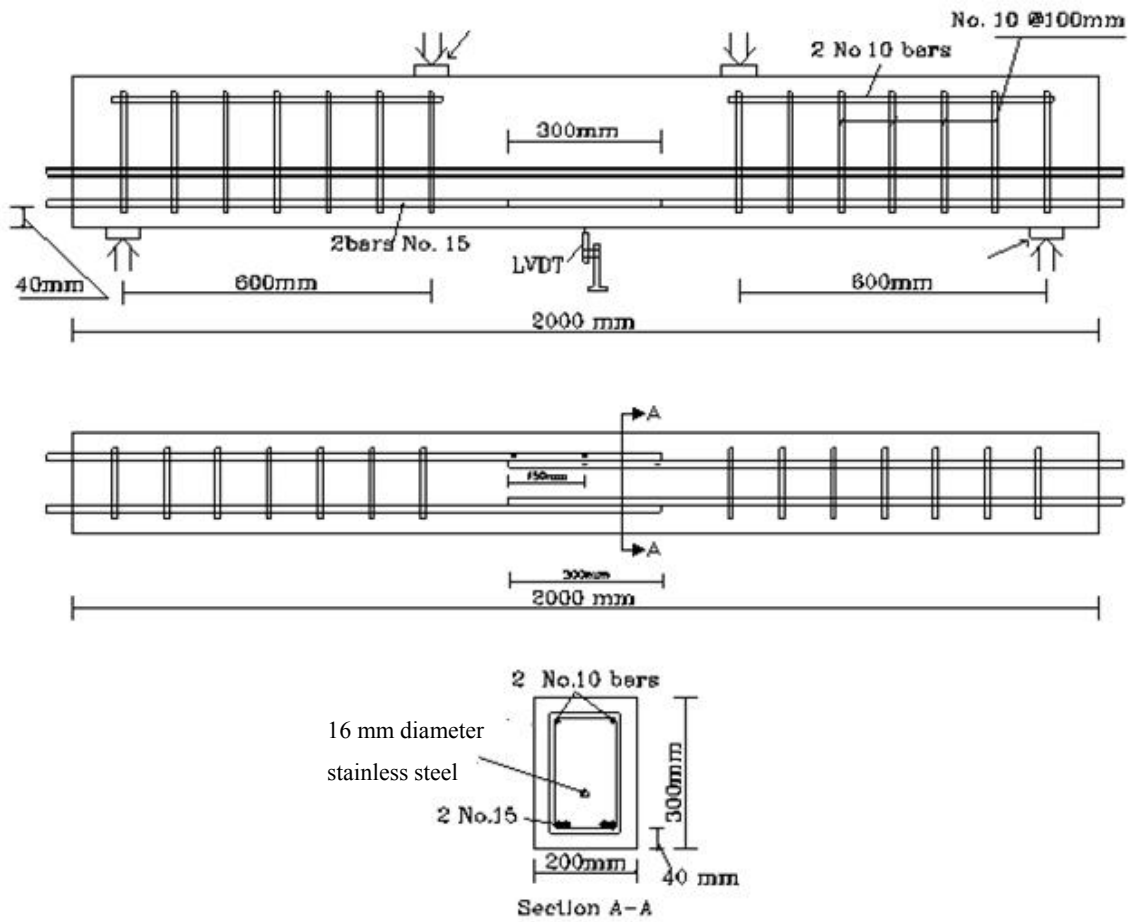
Beam configuration and reinforcement details ( $c/d = 2.67$ )
